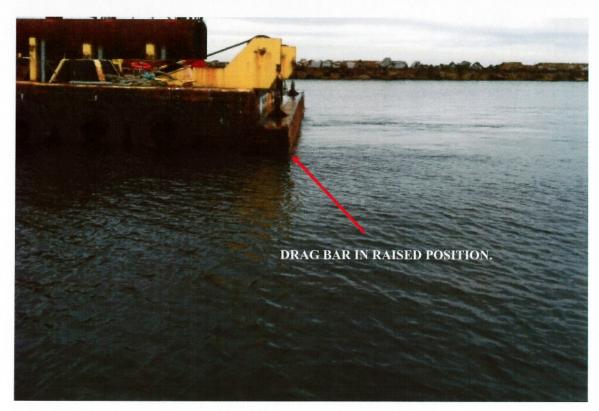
DRAG BARGE NO. 4. VIEW OF PORT STERN.
